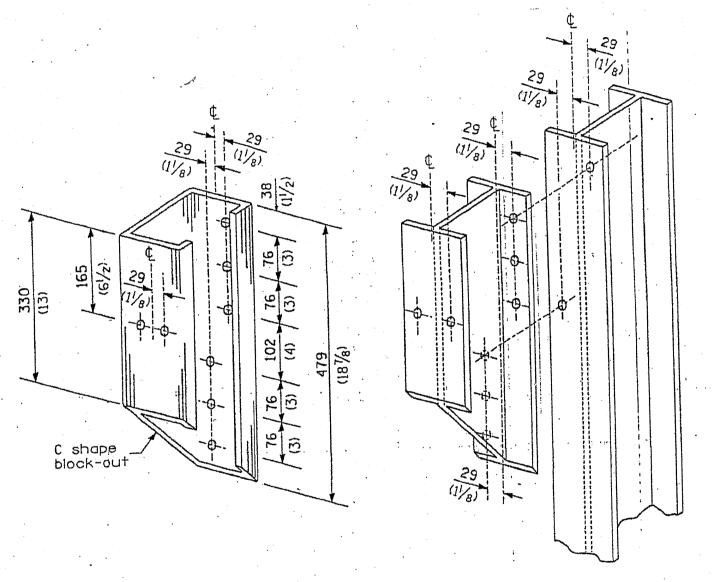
DETAIL OF CONNECTION OF GUARDRAIL TO SQUARE BRIDGE PIER OR FOUNDATION.
